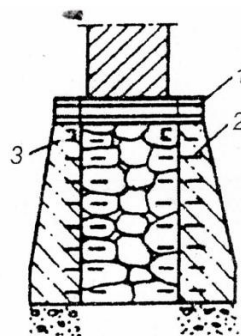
Combined strengthening and extension of foundations; 1 - Support beam, 2 - Anchors, 3 - Extension of foundations
